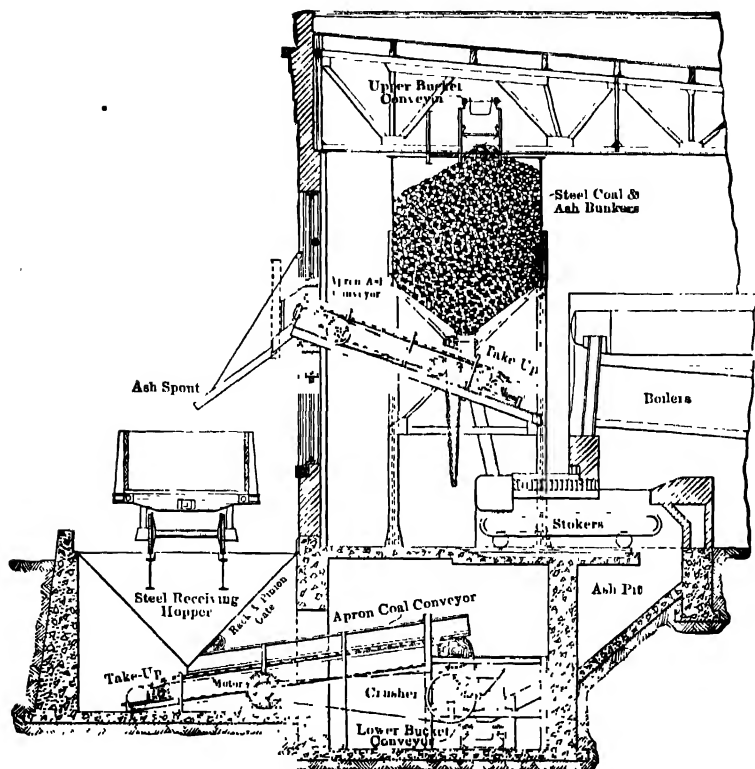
Typical Apron-conveyor Installation for Handling Coal and Ashes.
